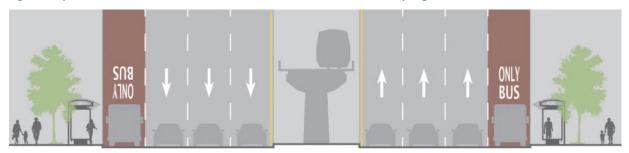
| Alternative 1 cross-section of Tyco Road from Route 7 to Spring Hill Road
